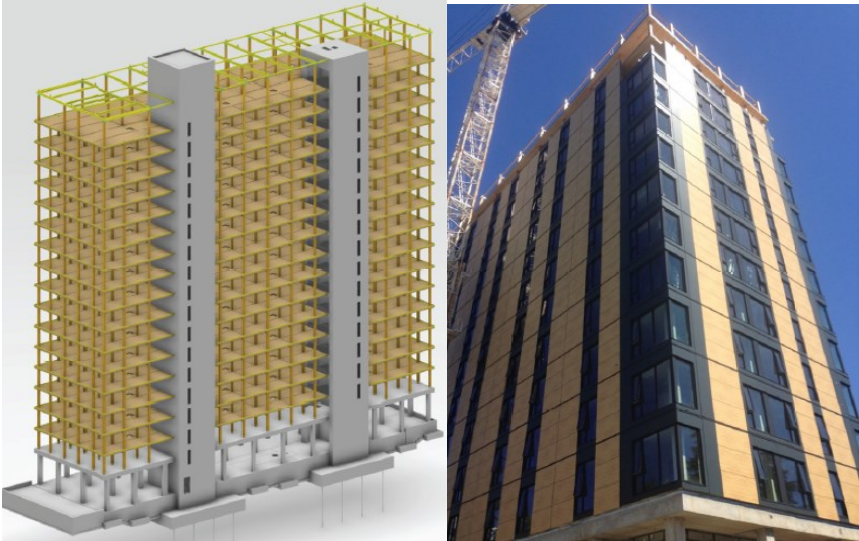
Hybrid structural system of UBC building (diagram adopted from Tannert, 2017)
